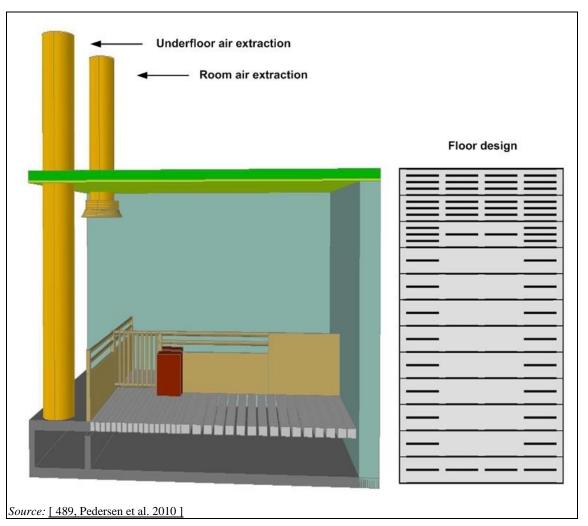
Layout of the ventilation system (left) and the floor design (right) with reduced slat openings
